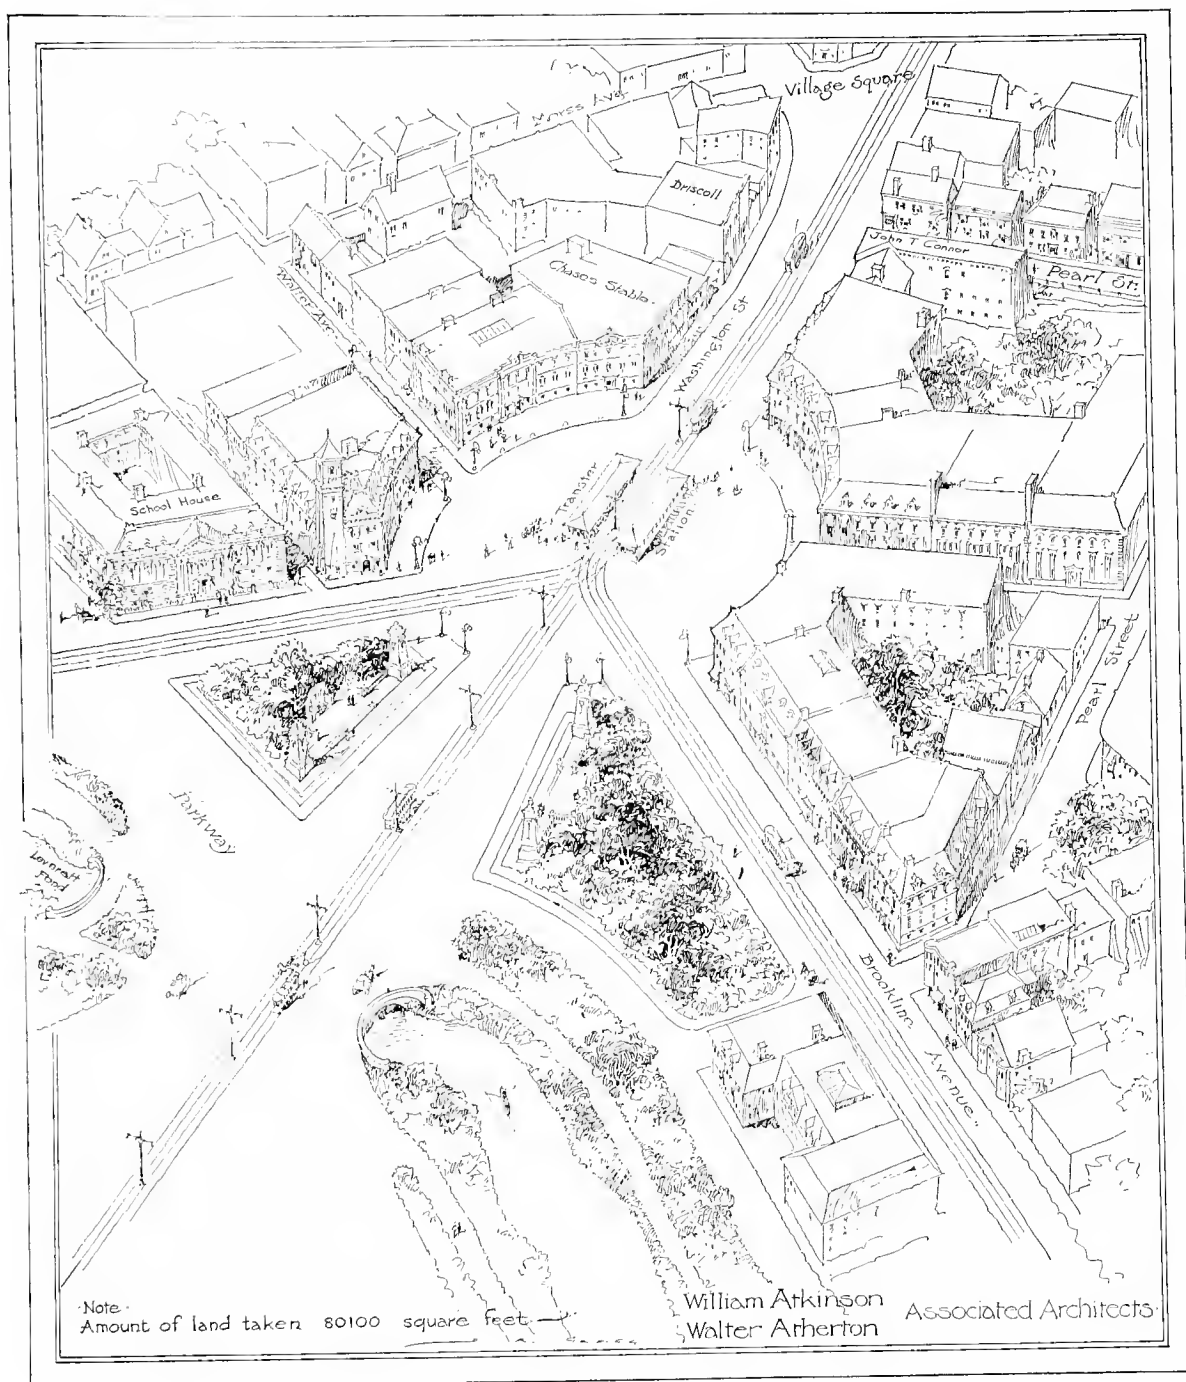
A Plan for an Entrance to the Town of Brookline.
